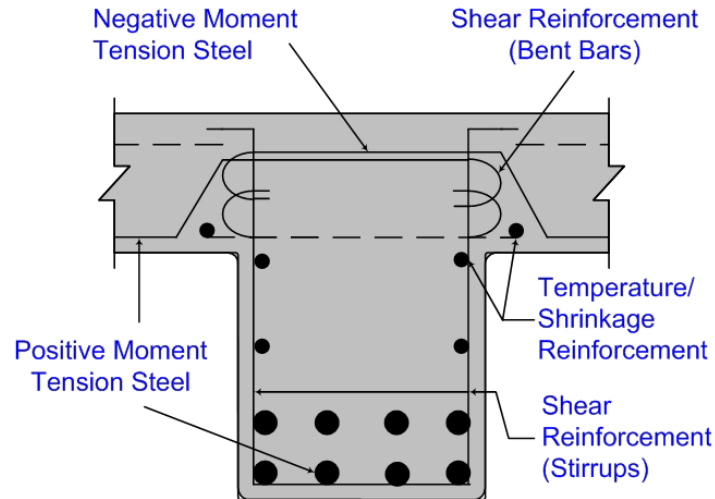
Steel Reinforcement in a Concrete Tee Beam
